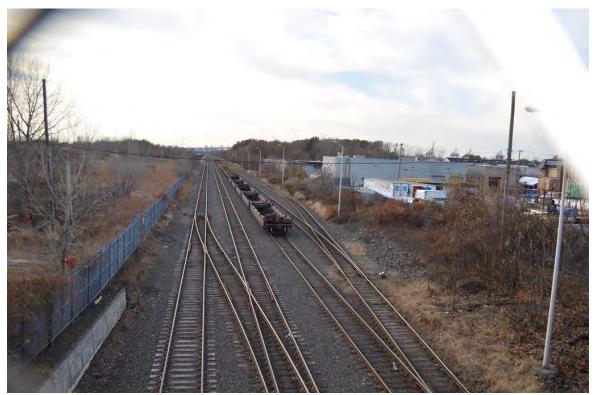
Section 5, the open cut between Van Pelt Avenue and Van Name Avenue. View looking east.
